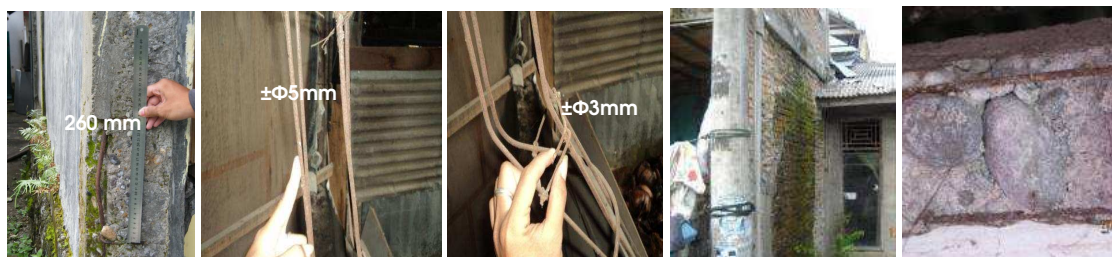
Spacing of stirrups, diameter of stirrups, diameter of main rebar, lichen on bricks & aggregate of damaged concrete (left to right)
